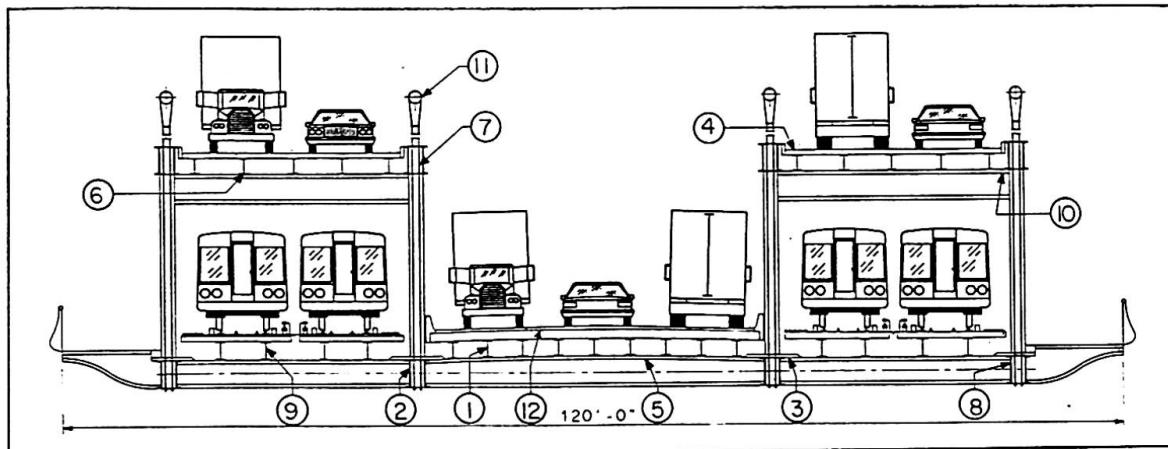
CROSS SECTION OF MANHATTAN BRIDGE, NEW YORK - *Major Defects Reported
